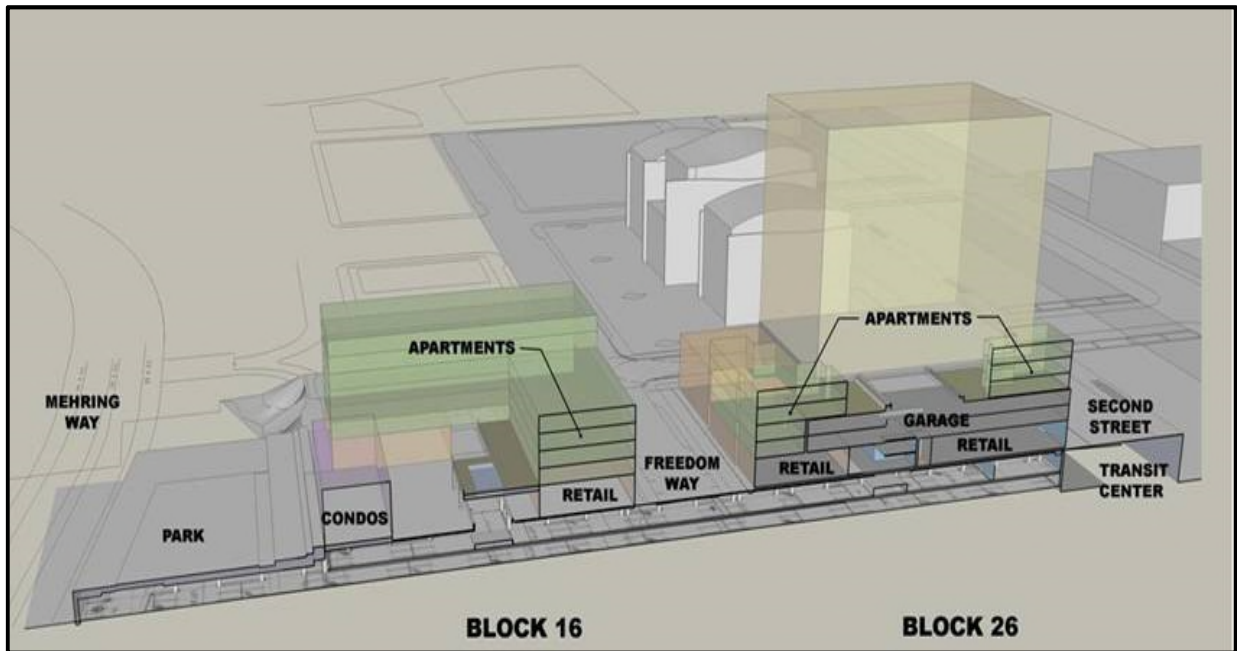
Cross Section of The Banks Intermodal Transit Facility
